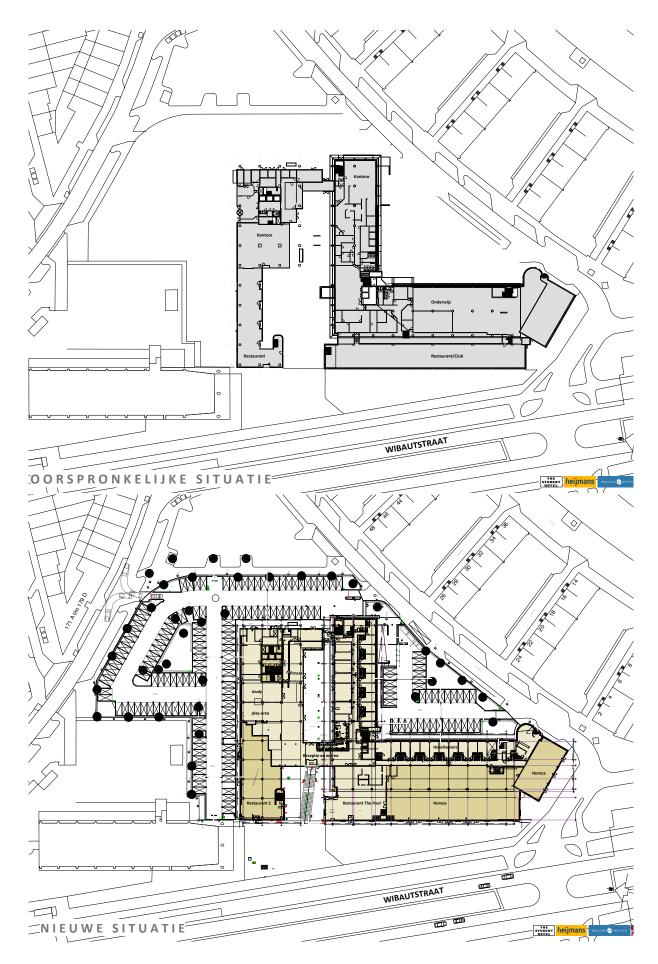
Floor plans before and after transformation (Penta Architecten, n.d.; NRP Gulden Feniks)
